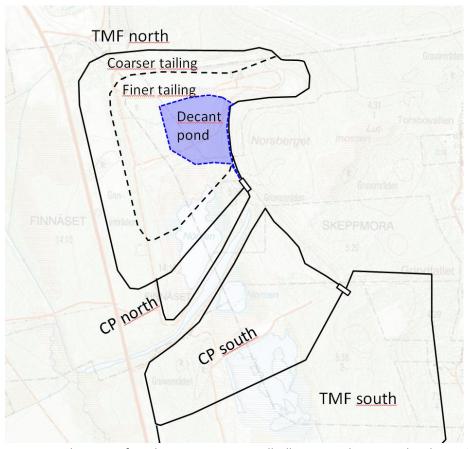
Plan view of northern TMF conceptually illustrating decant pool and run-off to spillway (at late stage of deposition +200 masl).
